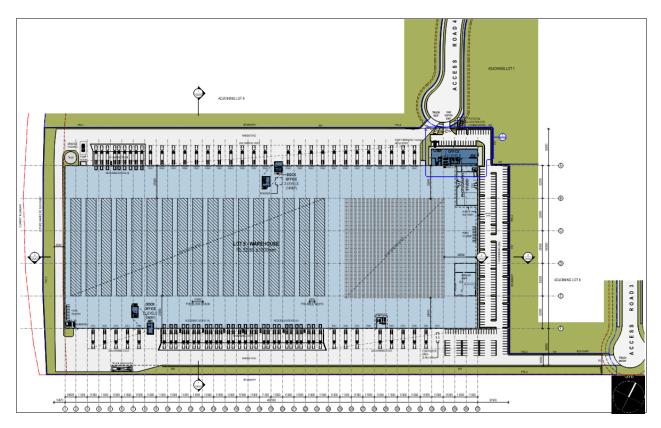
Lot 9 Site and Warehouse Floor Plan (SBA Architects – Issue for Client)
